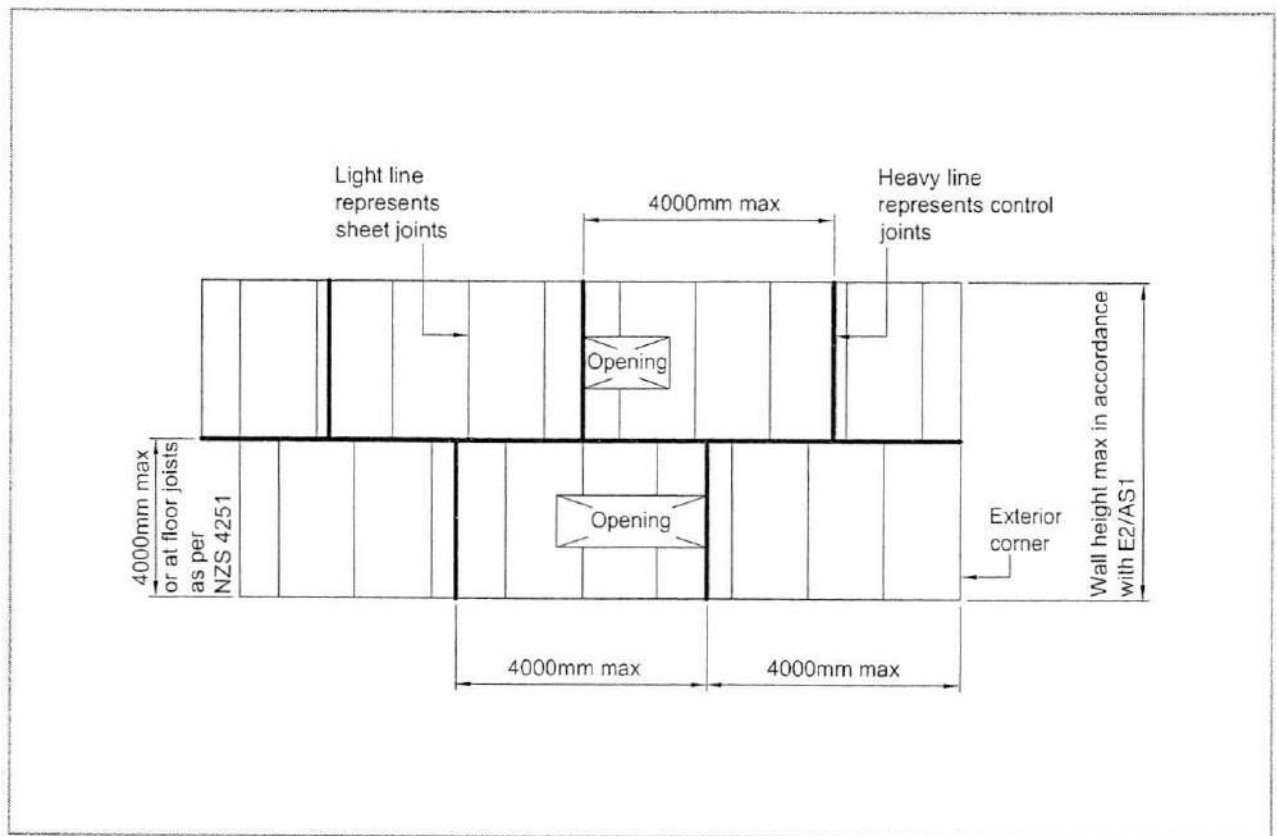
STUCCO CONTROL JOINT SETOUT
